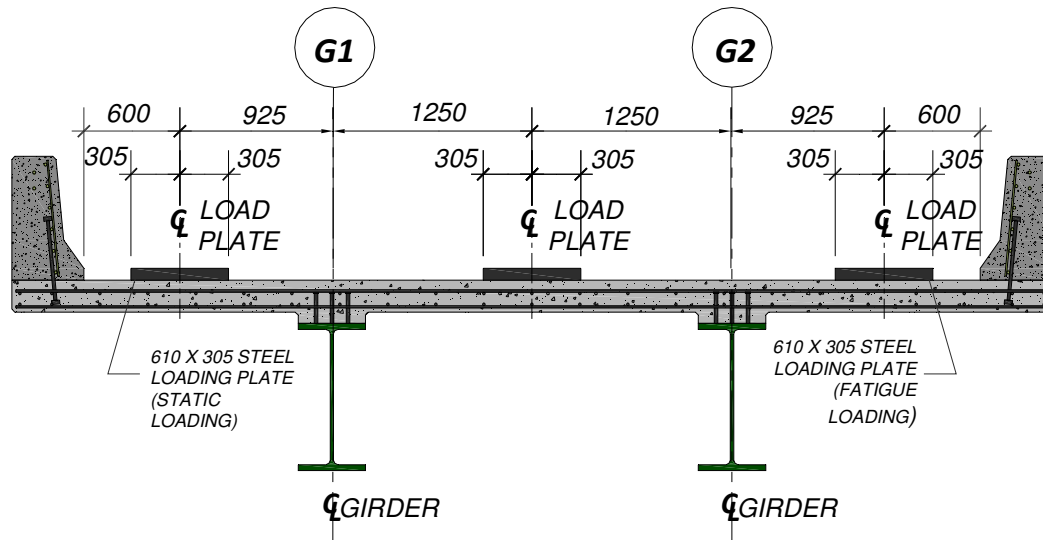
(b): Typical cross section illustrating transverse location of steel loading plate (Cross section “F” from Figure 3-16(a))
